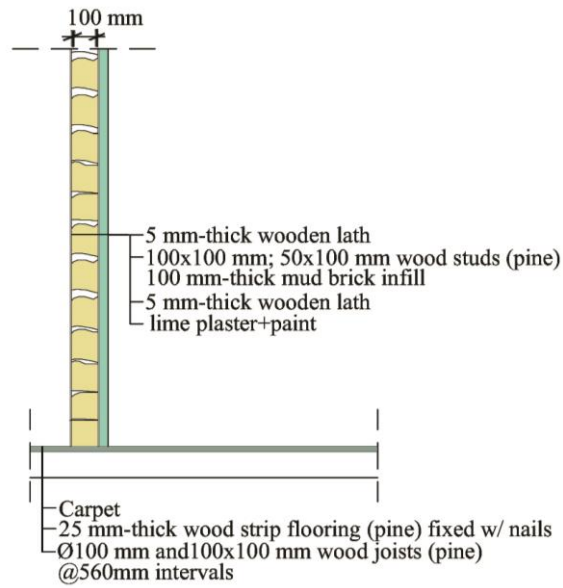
Sections of Original-Wall 4 & Original-Floor 4 in 1/20 scale (Drawn by author).
